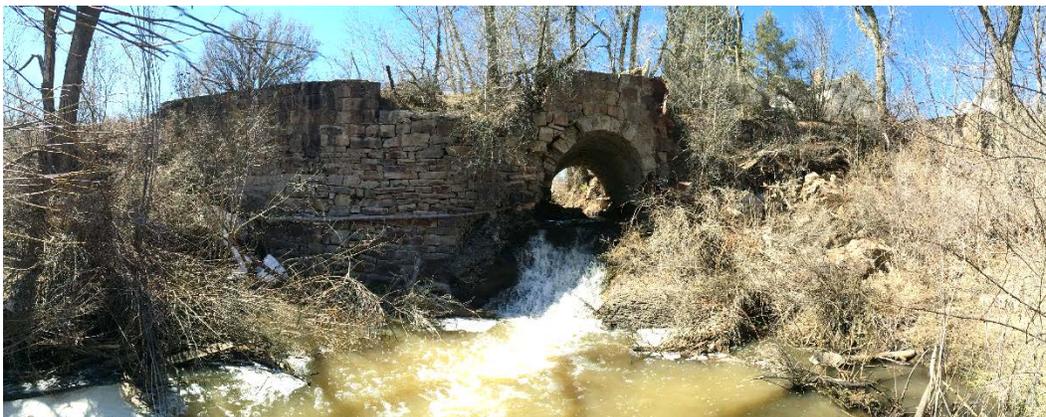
Bridge and adjacent retaining wall (image left) as viewed from the East. The spandrel wall is partially collapsed at the south abutment and has collapsed beyond the north abutment. The north wing wall and retaining walls have also collapsed and masonry fragments are visible in the bushes (image right).
